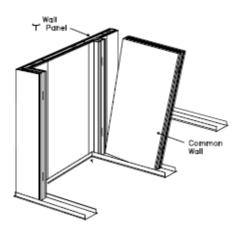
INSTALL WALL PANELS IN BOTH DIRECTIONS
